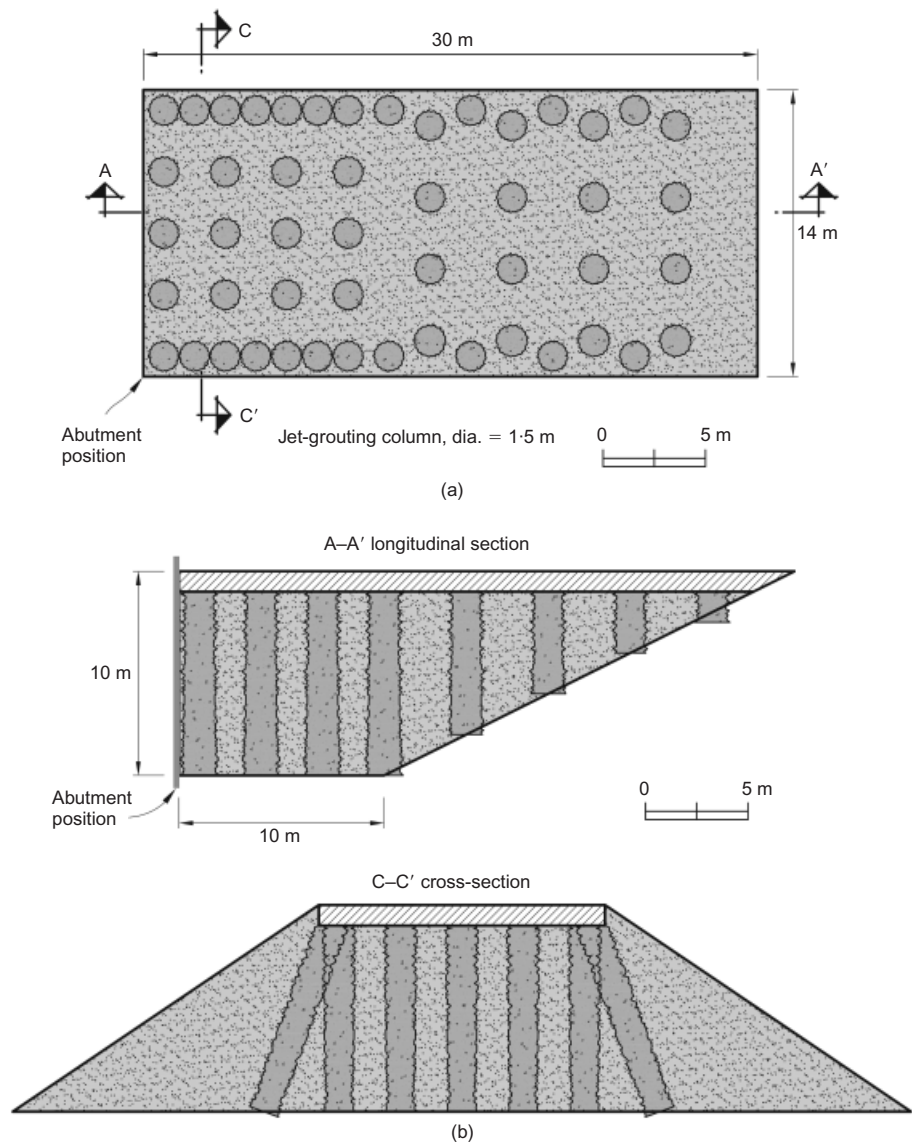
Jet-grouting treatment of embankments: (a) position of columns in plan view; (b) cross-sections
